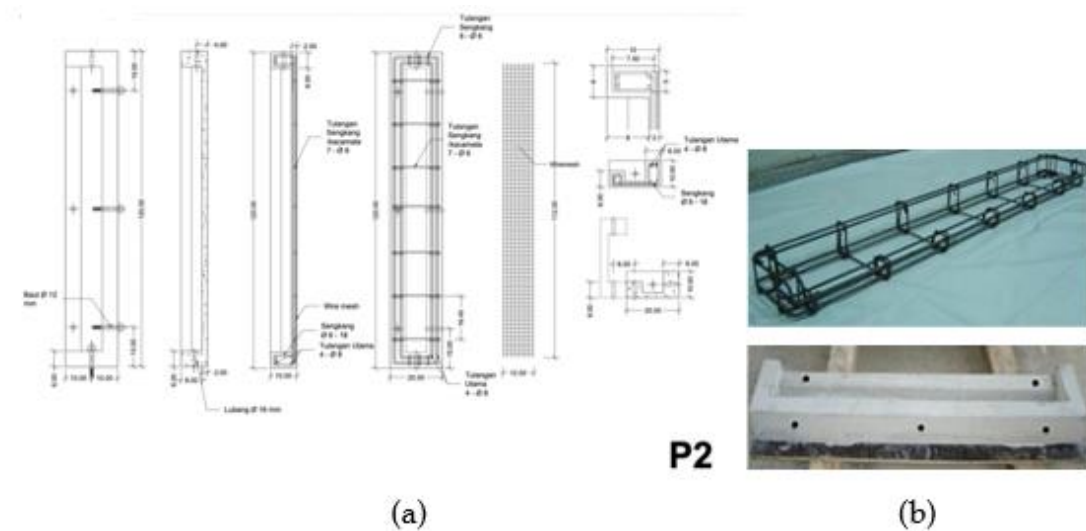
Component and Reinforcement Details for P2, Consists of its Rebar Detailing (A) and Real-Life Example (B)
